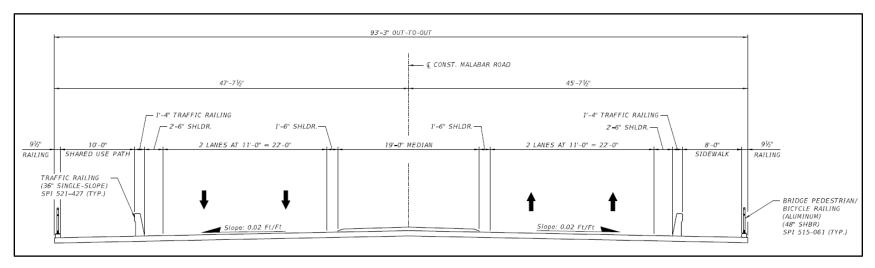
Preferred Alternative Typical Section – Bridge over Canal C-10
